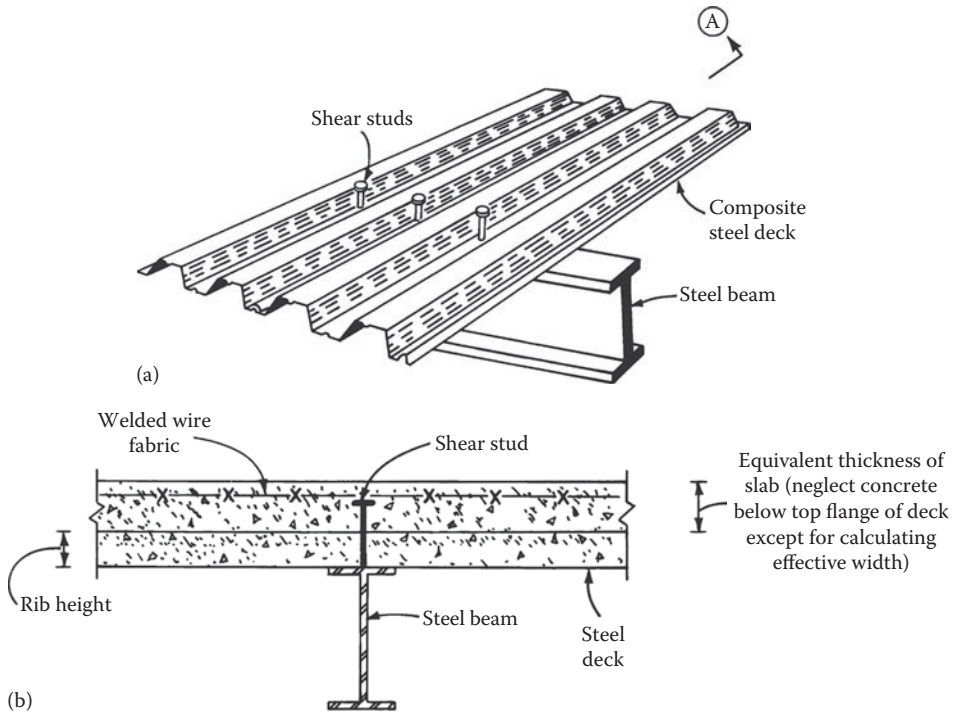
Composite beam with formed steel deck: (a) schematic view; (b) section A.
